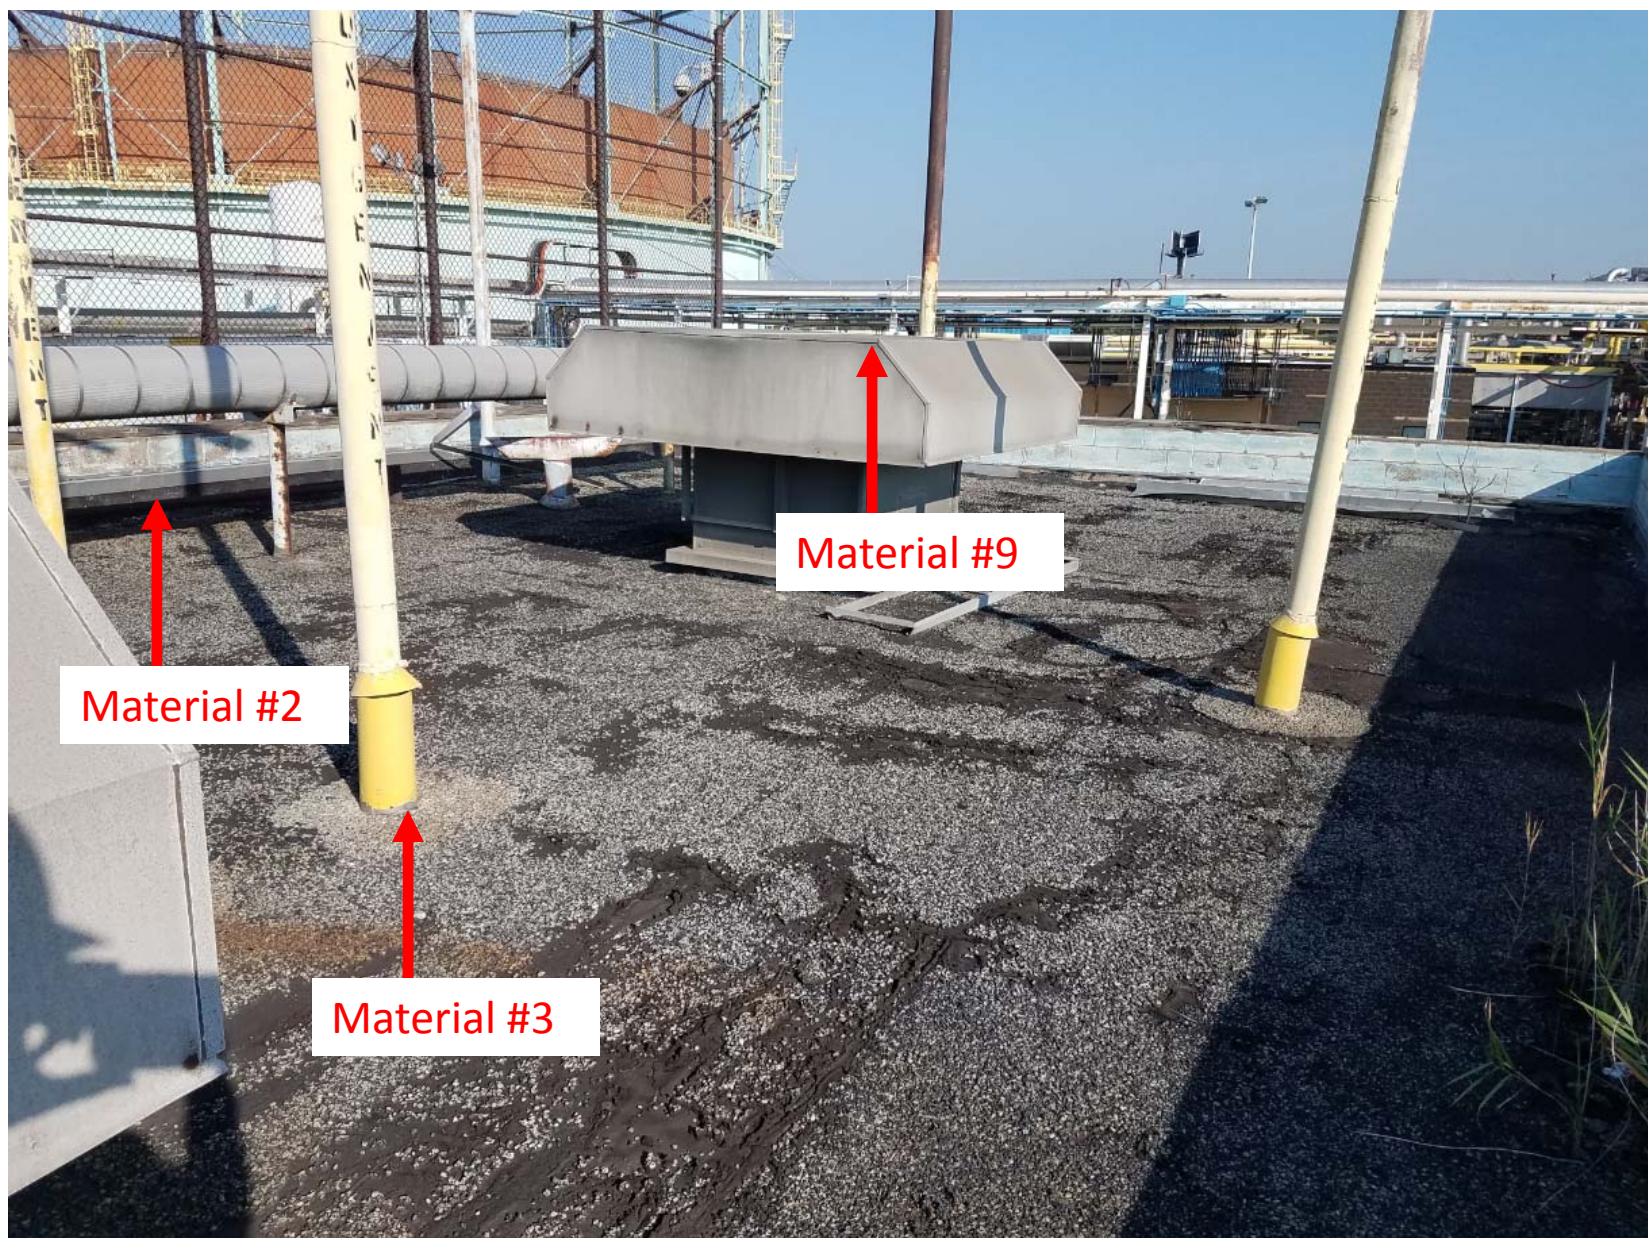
Roof of Northwest Building on Former Franklin Smelting Property as observed during asbestos survey completed on 08/10/2018. Asbestos-containing materials (ACM) noted in photo.
